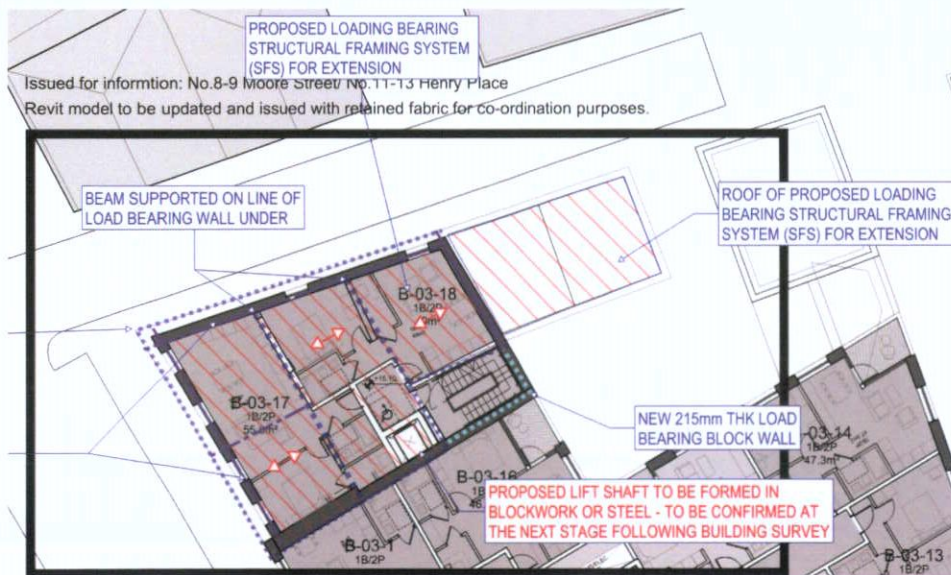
Steel at 3rd Floor to Support Extension Over 8-9 Moore Street.
